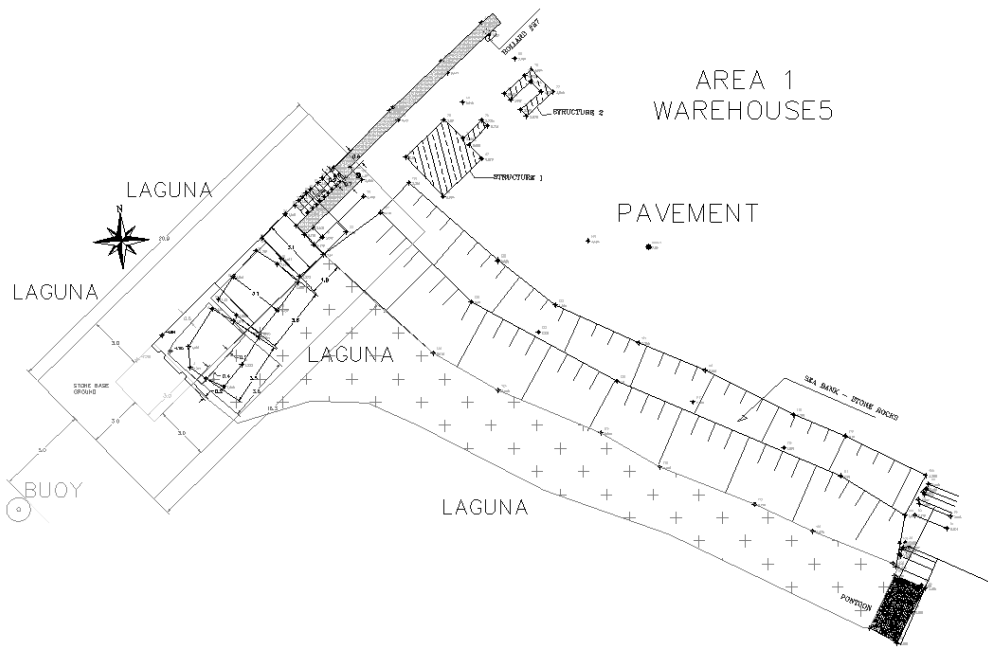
and 3.1.3-2 respectively show a general plan and a typical section of the existing structure at the edge of the existing north quay. As presented in the figures, the alignment of the concrete blocks layered is basically straight except for top layer of the blocks. The width of the blocks is about three (3) meters and the length of the whole structure combined above the seabed is approximately fourteen (14) meters. The structure consists of four (4) layers of the concrete blocks above rubble stone foundation of two (2) meters thickness. The elevation of the existing quay is 3.5 m above Chart Datum Level (CDL) and that of the top layer is about 1.5 m from CDL. There is a terraced access concreted between the quay and the top layer of the blocks.
